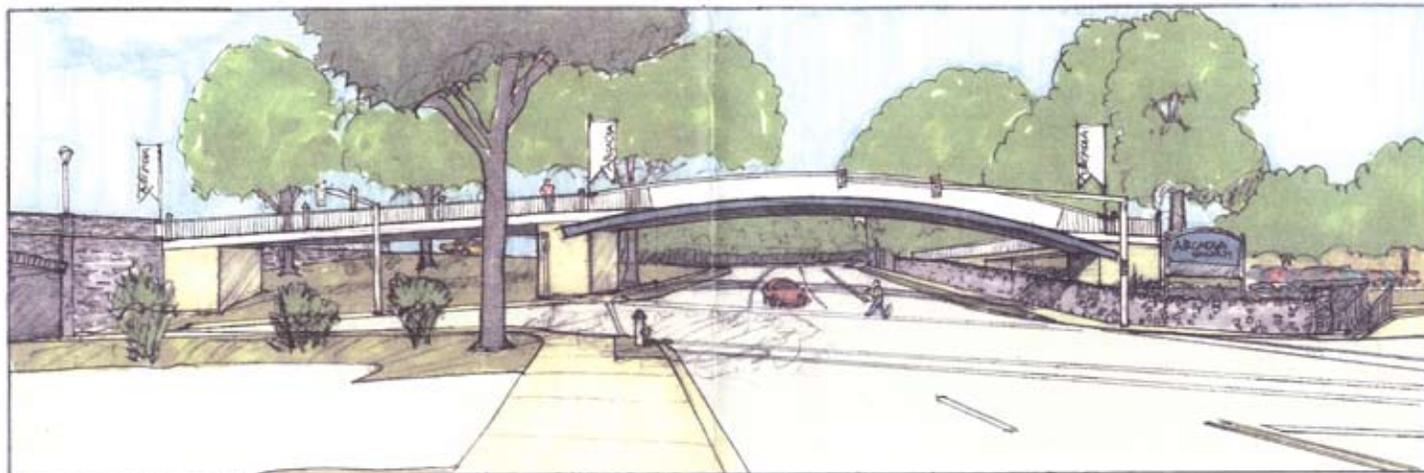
Main Street Design Committtee design for a pedestrian bridge connection to Easton Road (source: Glenside Main Street Design Committee)
